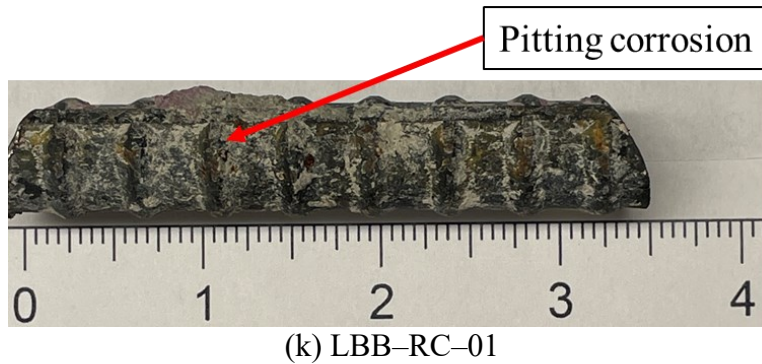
Extracted Black Rebar from Concrete Core Specimens (Cont.).
